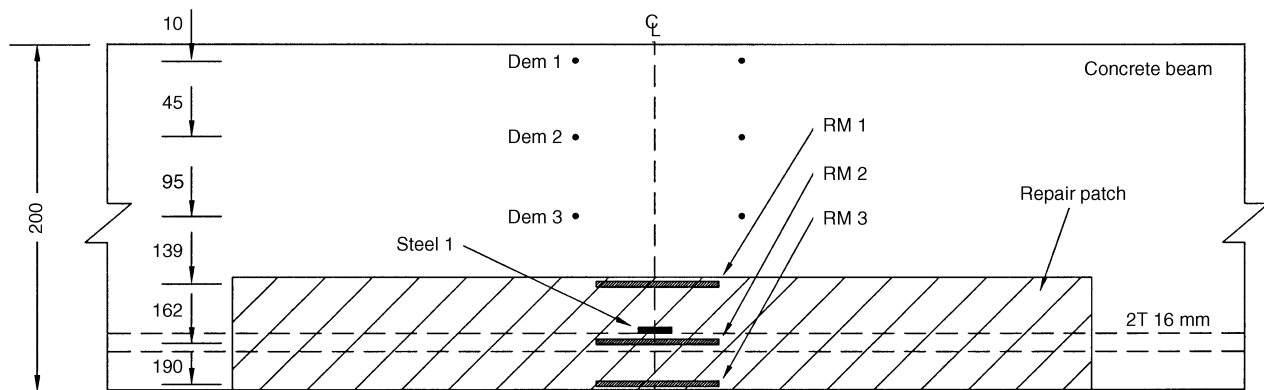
Location of strain gauges in the repair patch of the laboratory beams (all dimensions in mm)
